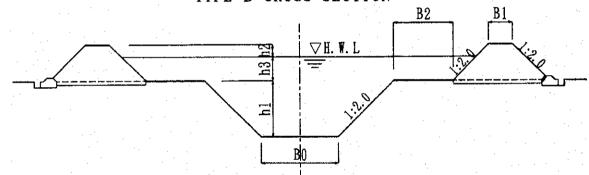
PROPOSED CROSS SECTIONS FOR (2/3) UPPER INDRAGIRI RIVERS
